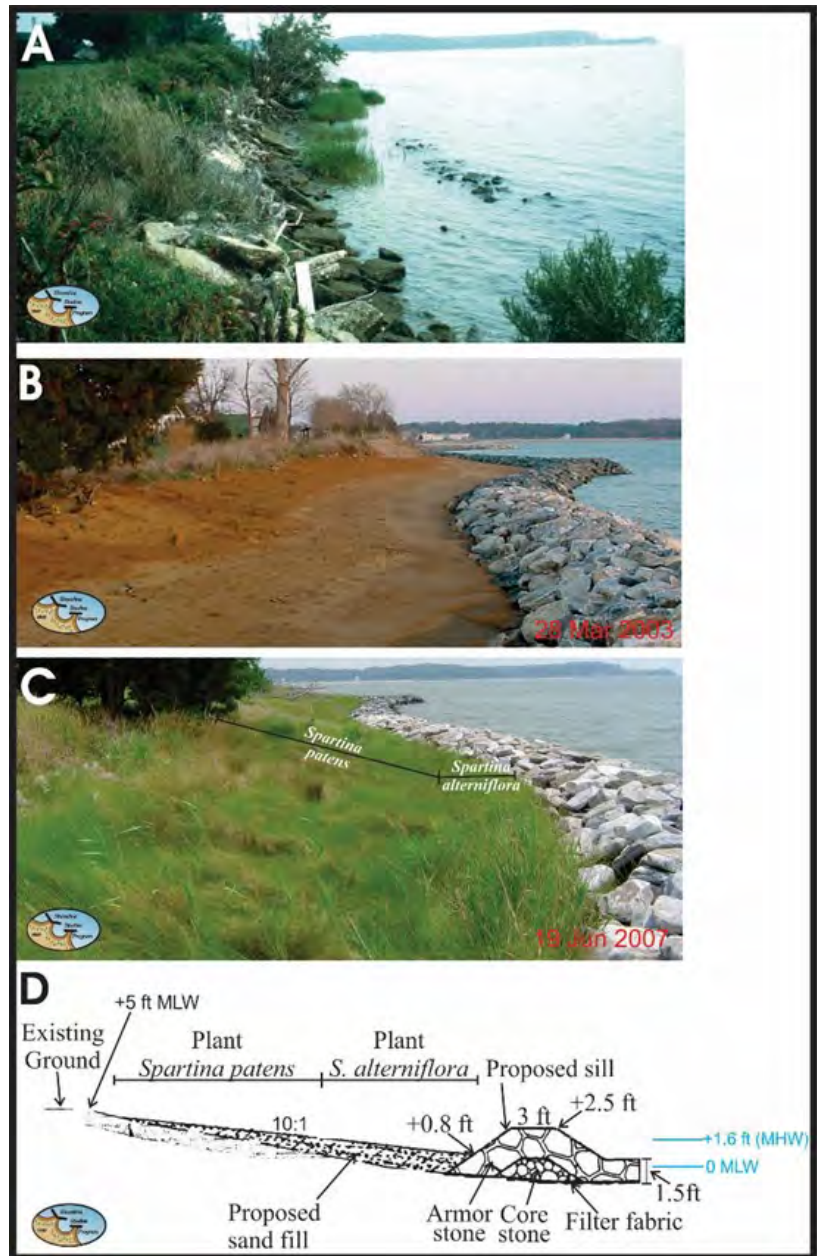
Sand fill with stone sills and marsh plantings at Webster Field Annex, St. Mary's County, Maryland A) before installation, B) after installation but before planting, C) after four years, and D) the cross-section used for construction (Hardaway et al., 2010).
